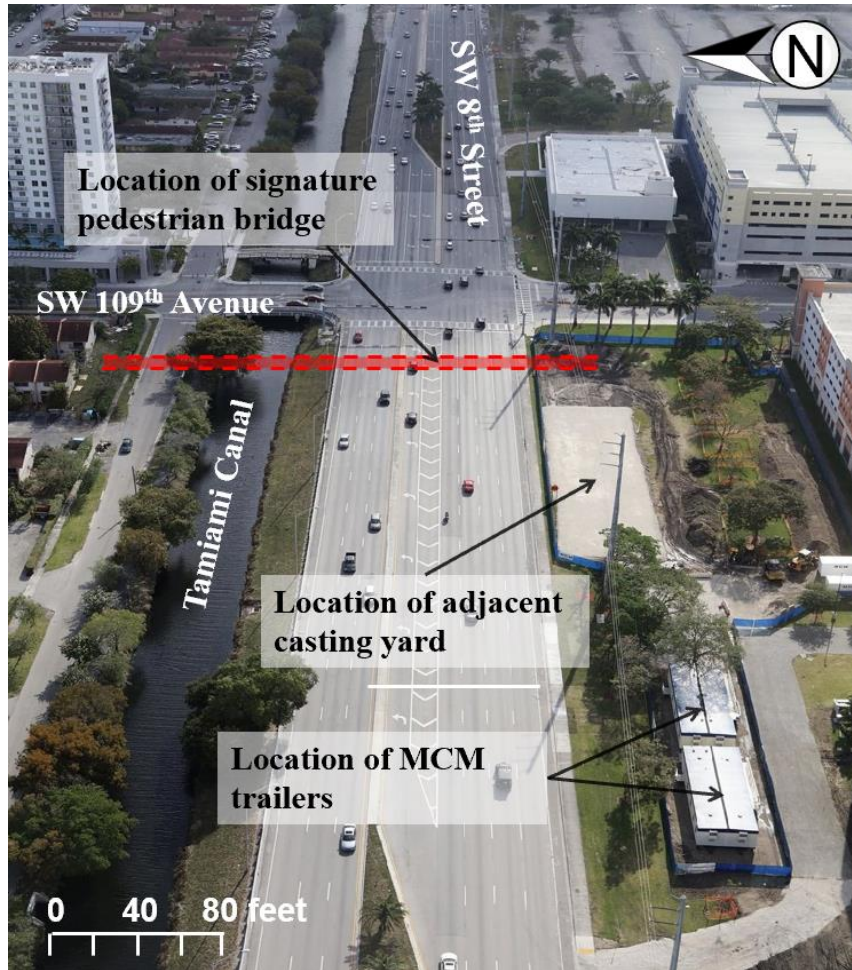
Location of the adjacent casting yard and MCM trailers in relation to the location of the signature pedestrian bridge over SW 8th Street and Tamiami Canal looking to the east (Source: Munilla Construction Management (MCM) modified, Date of Photograph: 3/26/2017)
